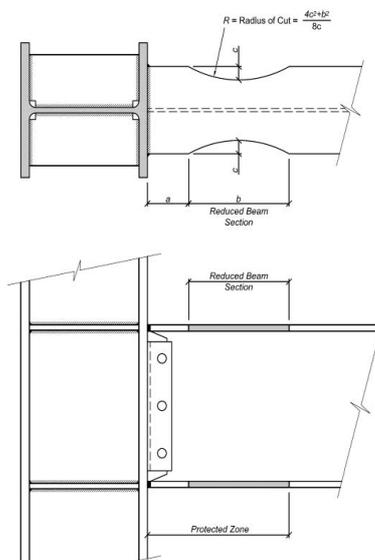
Reduced beam section, from ANSI/AISC 358, 2010
